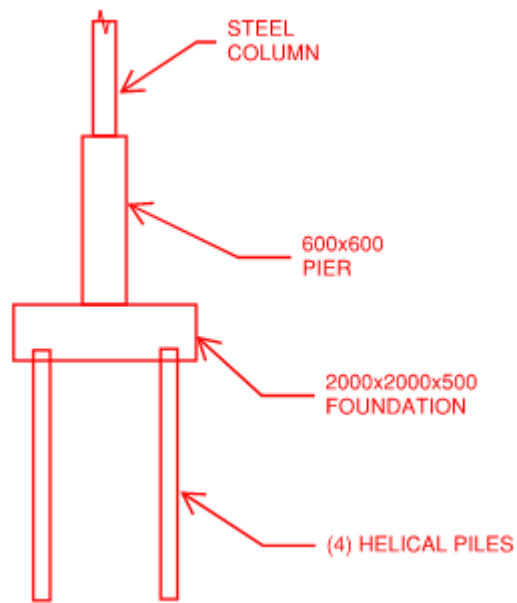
Typical Foundation Detail – Proposed Outdoor Gantry.
